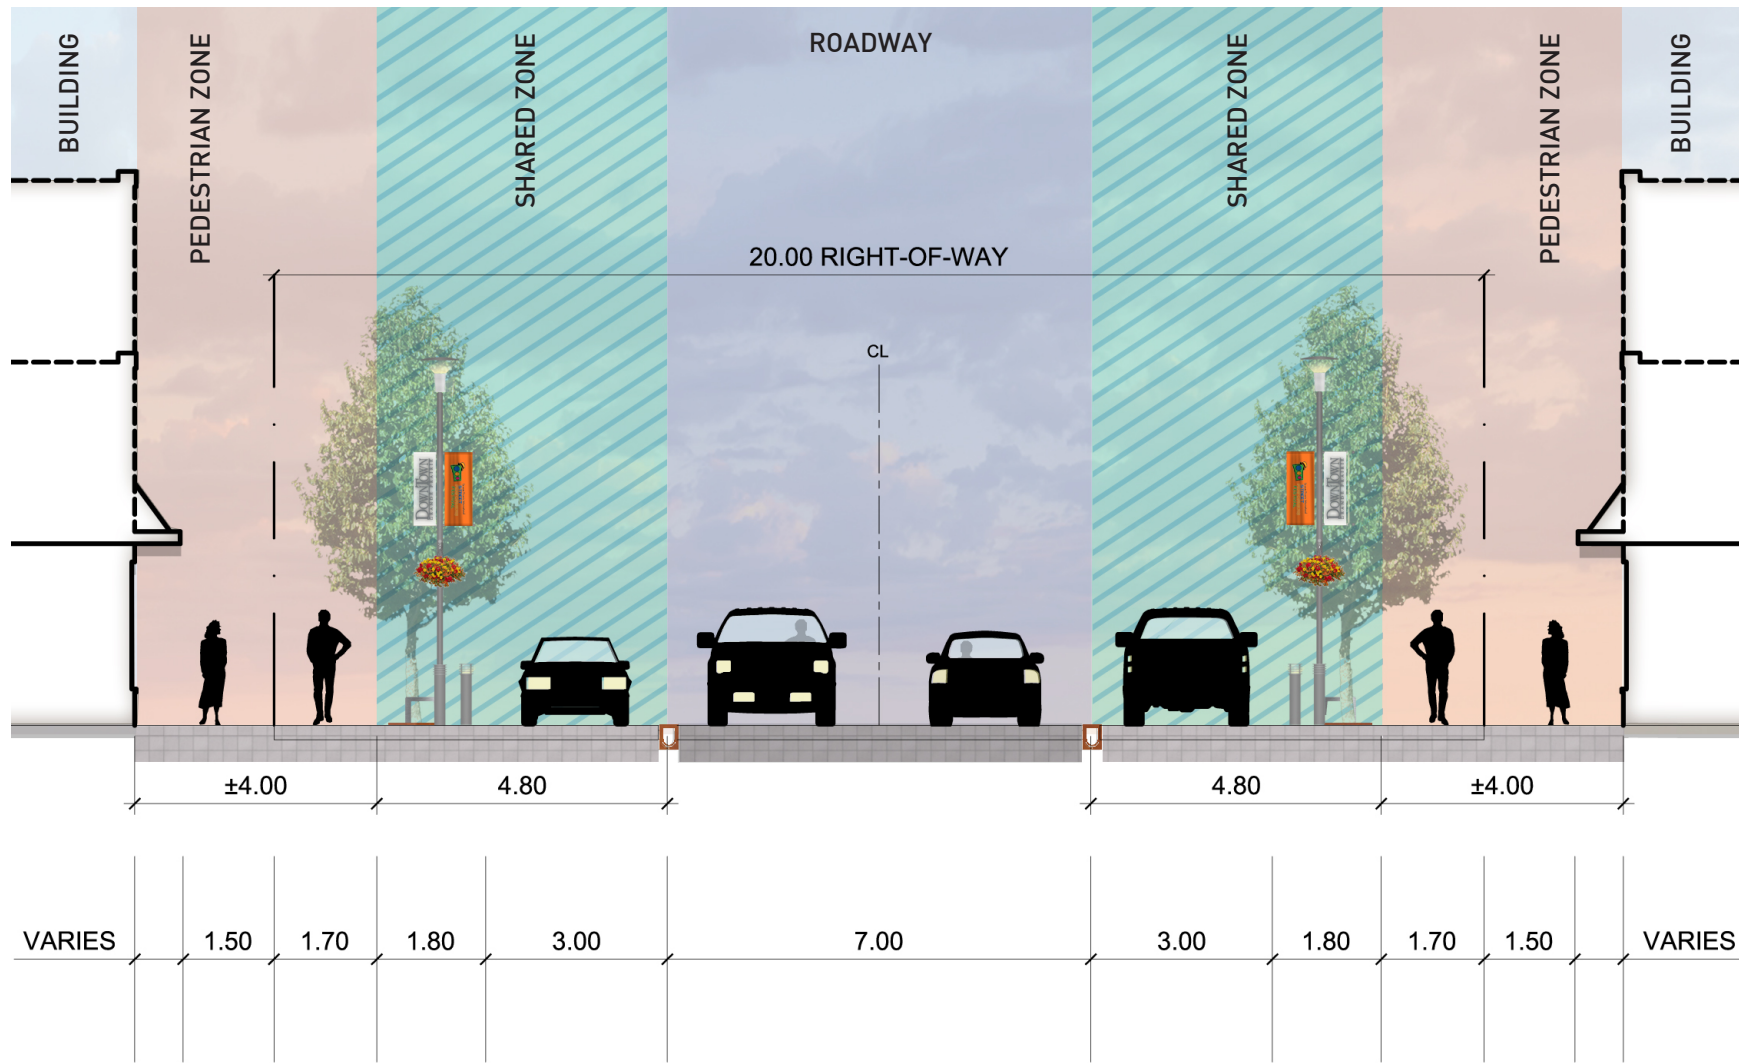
101st Avenue Shared Festival Street ROW Cross Section
